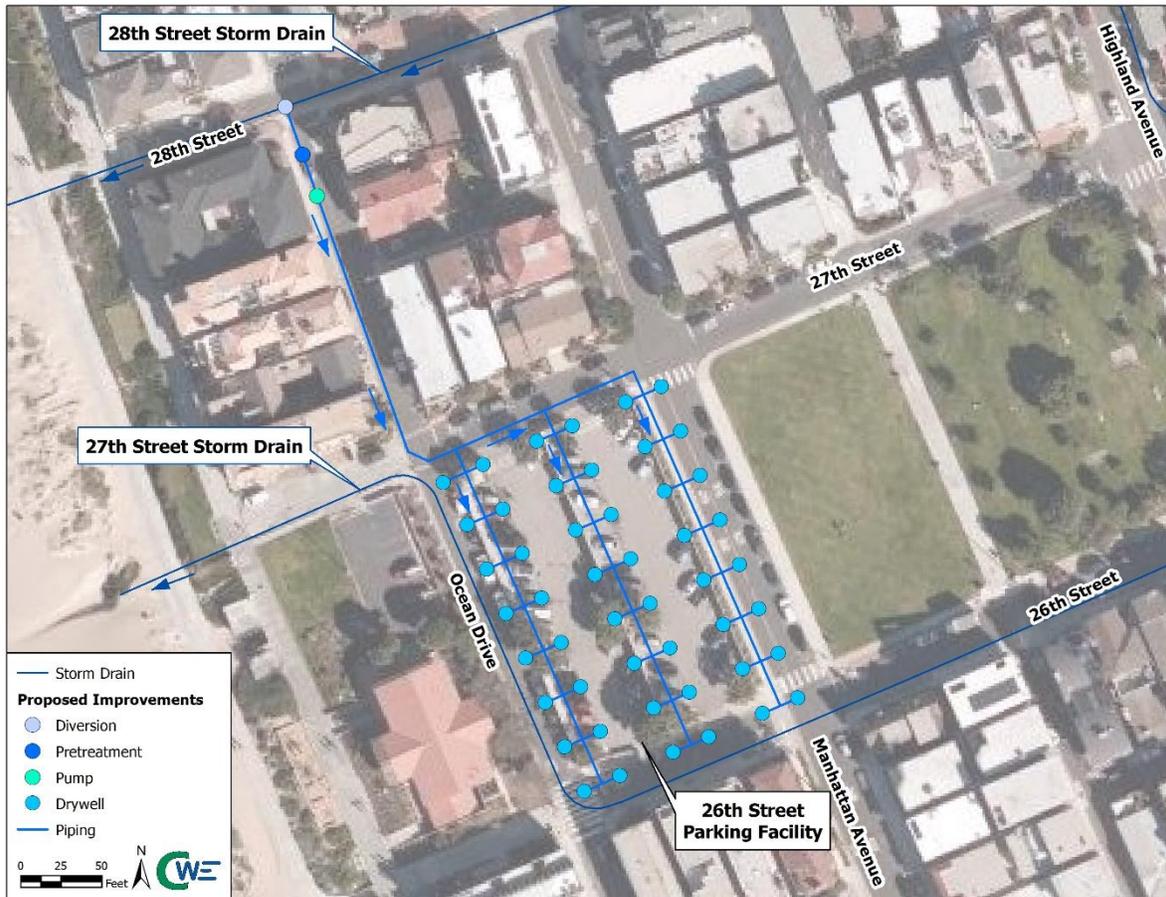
Phase 1: 26th Street Parking Facility Drywell Concept
